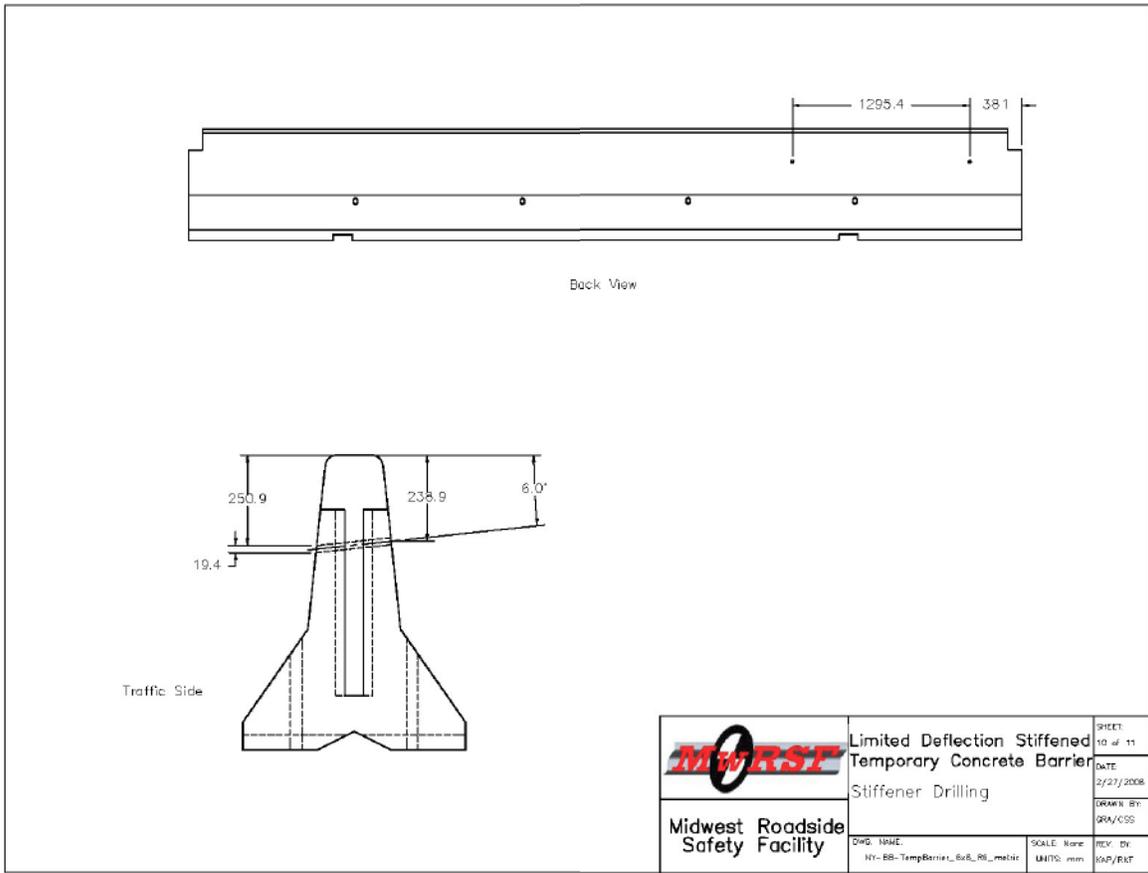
Temporary Concrete Barrier Stiffener Hole Details, Test NYTCB-3
